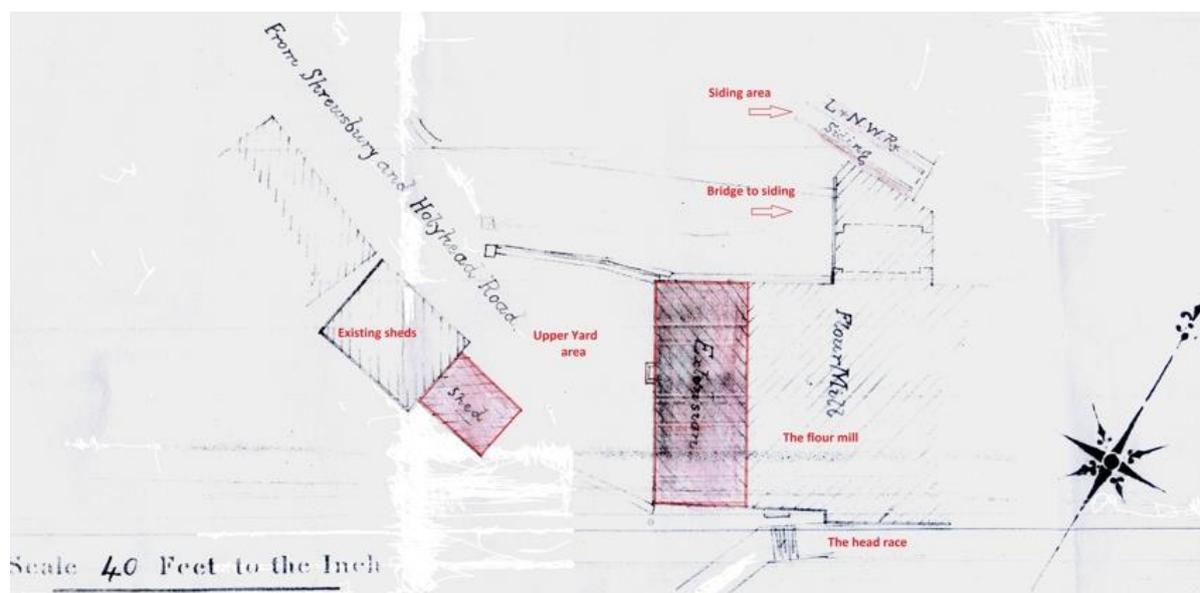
Plan of new buildings to be constructed at Penlan Mill as per endorsement to the 1883 Lease, dated 24th July 1885.²⁶¹
